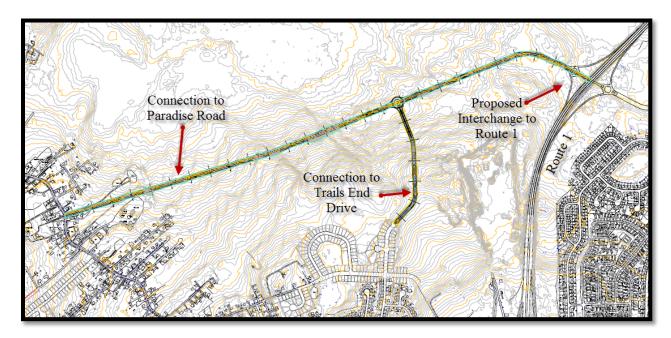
Proposed Route 1 - Interchange and Roadway Connections
